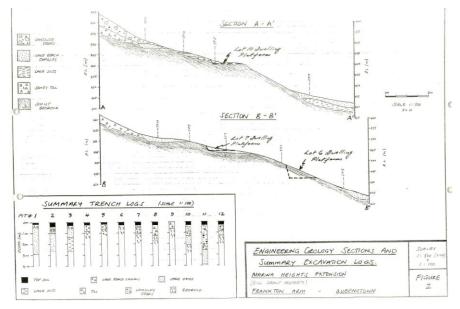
Extract from Canterprise review of amended subdivision proposal and illustrating location of proposed building platforms, 31 August 2001.
